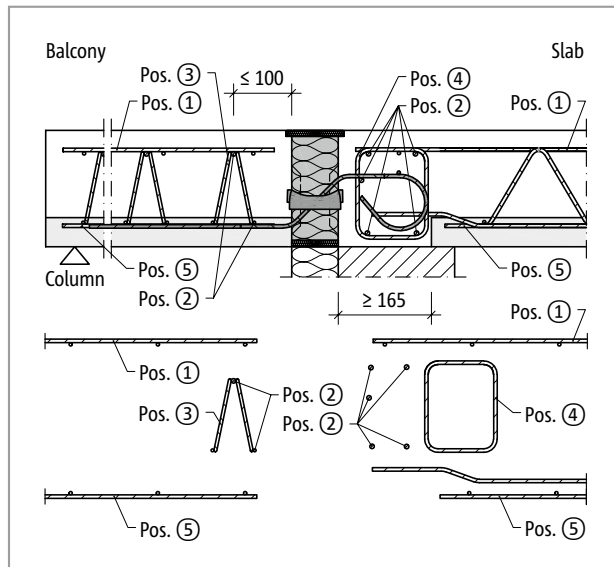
Schöck Isokorb® T type Q-V1 to Q-V5: On-site reinforcement with lattice beam
